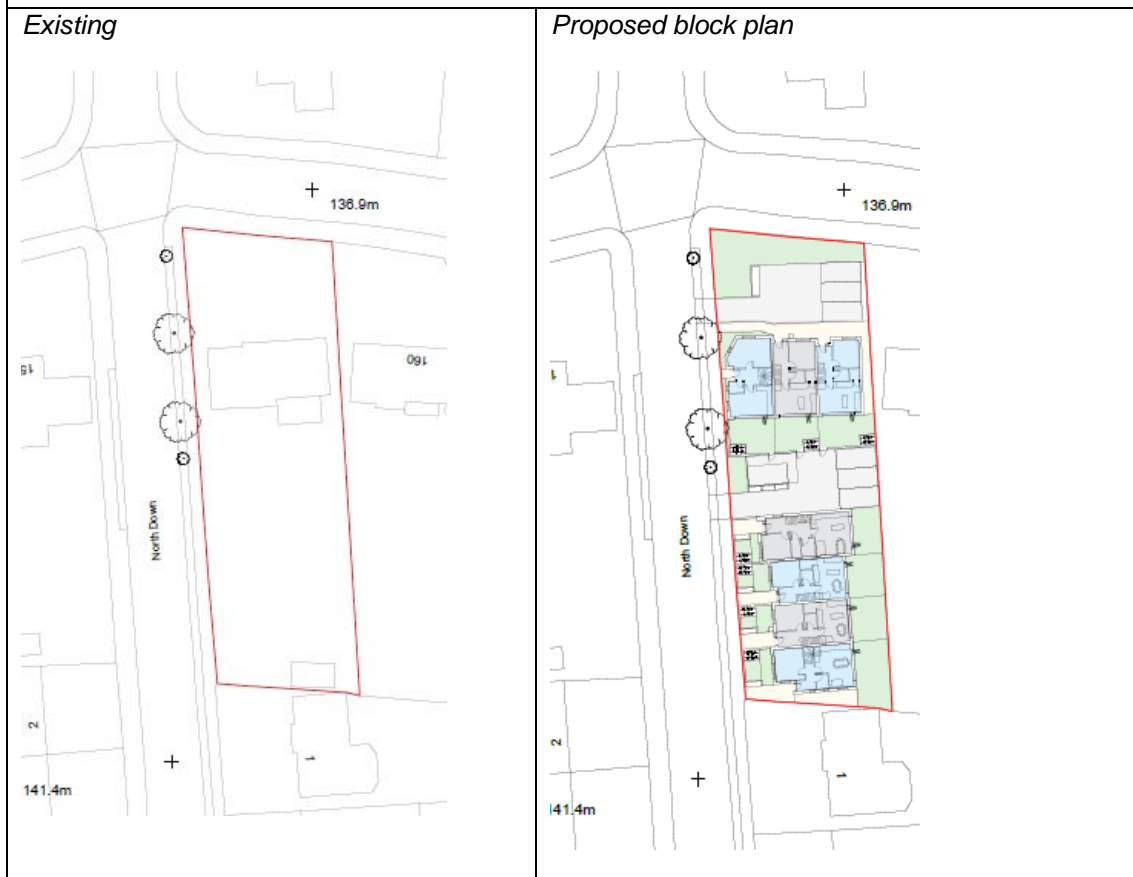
SDG guidance on corner plots and existing/proposed block plan
